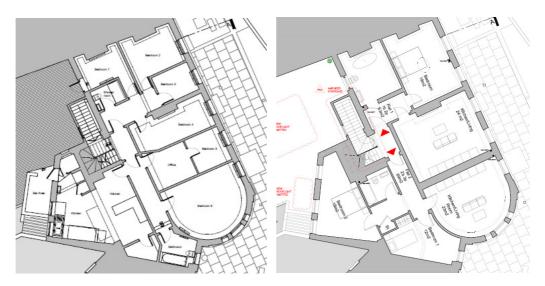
Existing (L) and proposed (R) first floor plans, showing the return of this floor level closer to its original layout, with more significant alterations concentrated at the already much-altered and compromised rear
